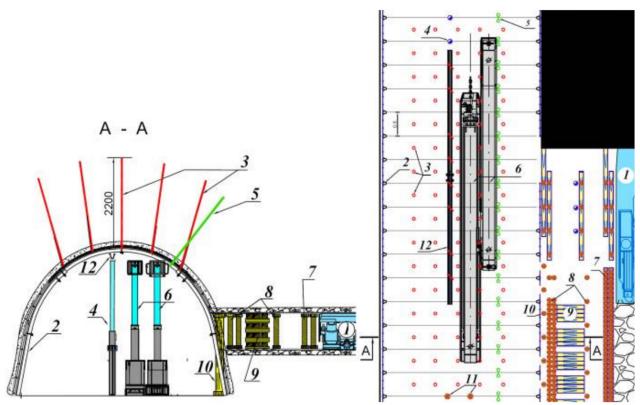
The "classic" support and reinforcement pattern of the gateroad #163 at intersection with #161 longwall: 1 -longwall set of equipment; 2 -steel arch support KShPU-17,7; 3 -rock bolts; 4 -hydraulic props installed 20 m in front of the longwall face and under the horsehead; 5 -rock bolts connected to the top section of arch support; 6 -face-end supports; elements of roadside pack: 7 -breaker row; 8 -breaker props; 9 -chock; 10 -wooden prop between the roof of the seam and the floor of the gateroad; 11 -wooden props installed under each arch; 12 -steel horsehead
